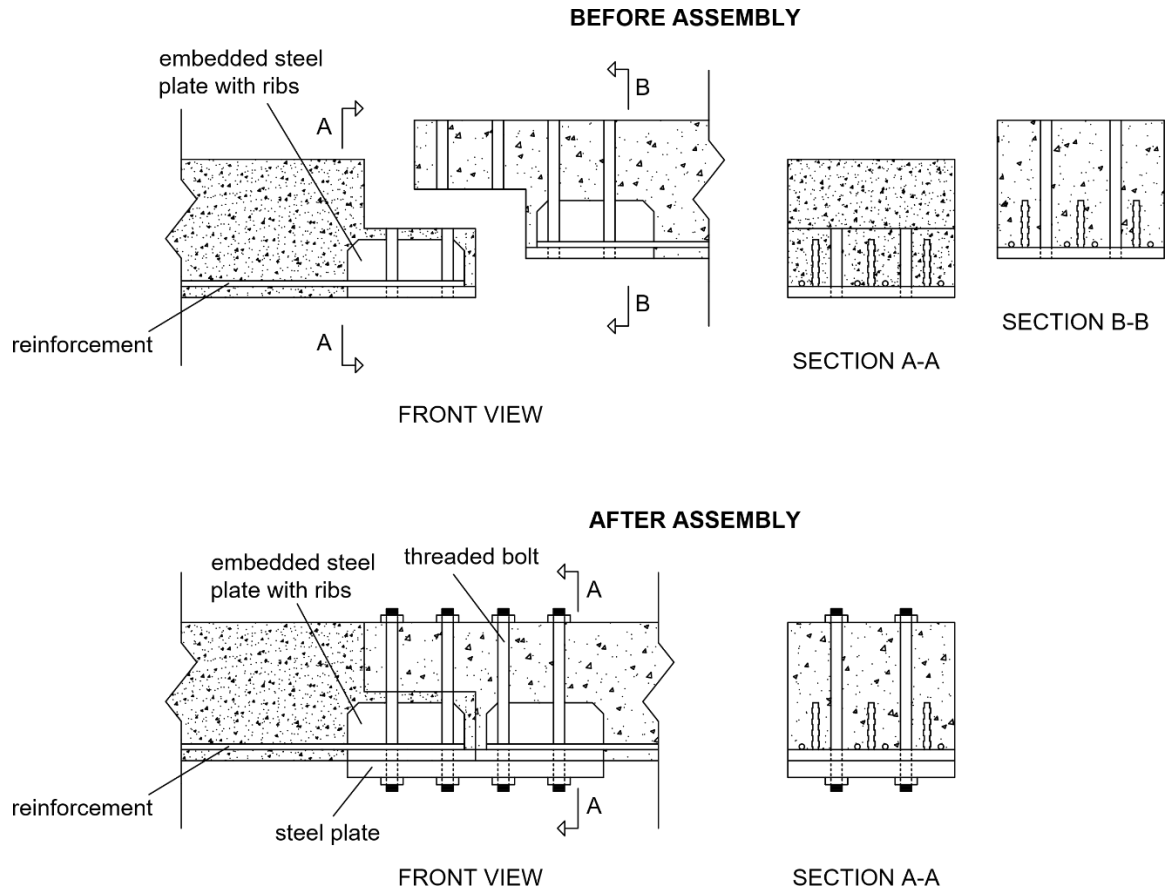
Schematic representation of a slab/slab concrete dry connection – solution 2.
